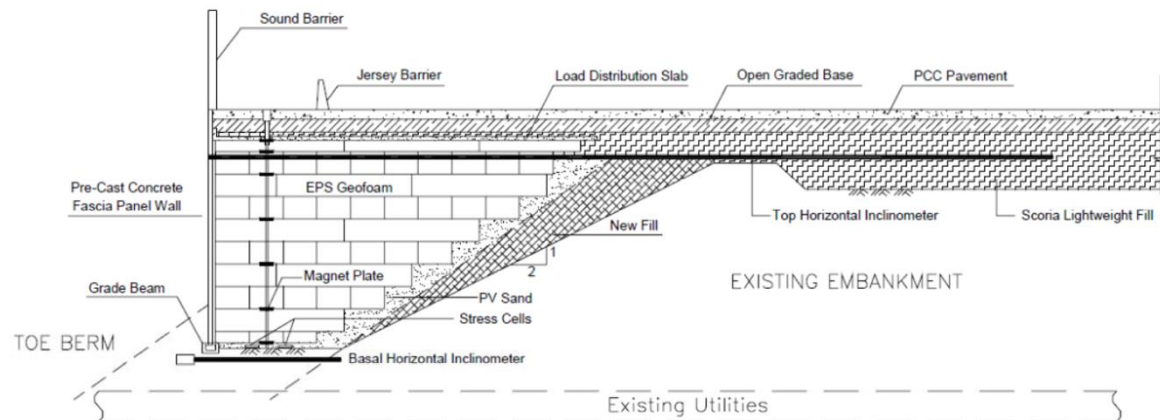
Cross Sectional View of the EPS Embankment and Instrumentation at the 100 South Street.
